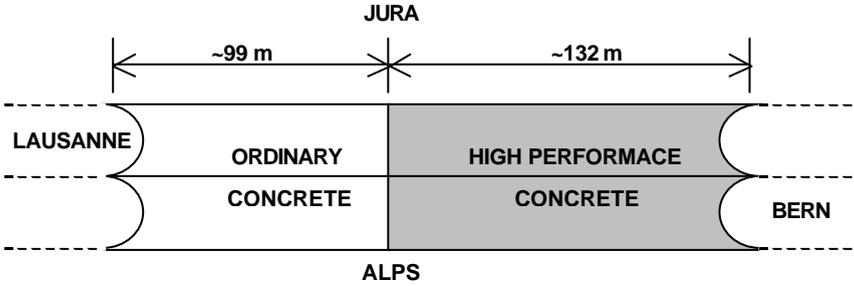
Simplified Plan View of the Cut-and-cover Tunnel of Champ Baly
